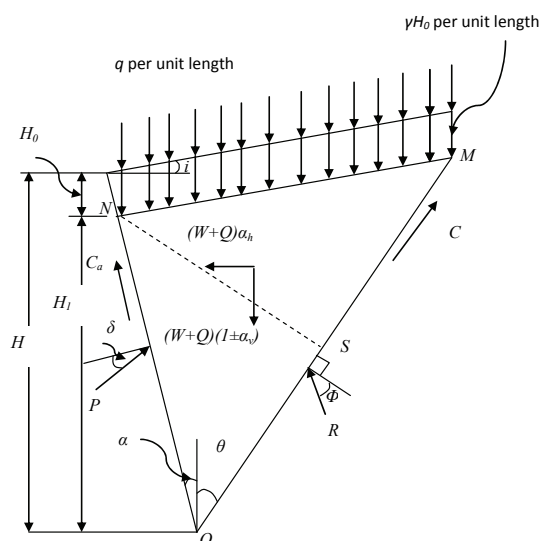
Forces Acting on Retaining wall – Soil Mass System during Active State of Equilibrium
